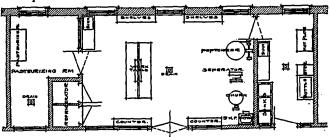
FIG. XIV .- FLOOR PLAN FOR MILK STATION.
